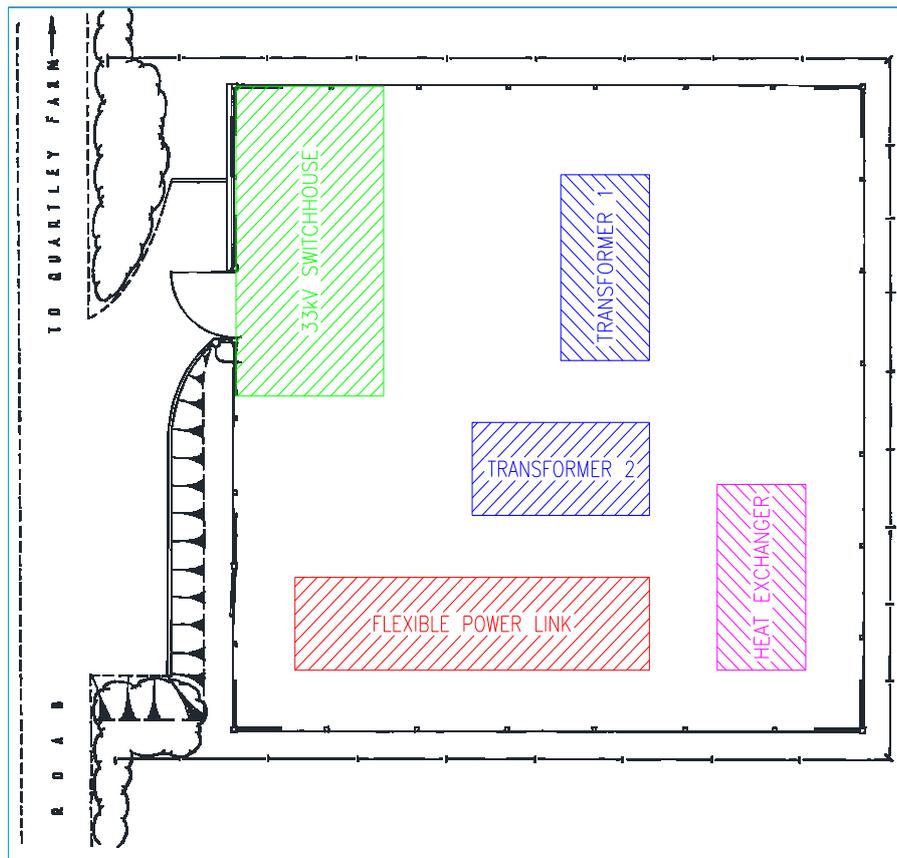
Proposed FPL and 33kV Switchhouse Layout at Quartley
